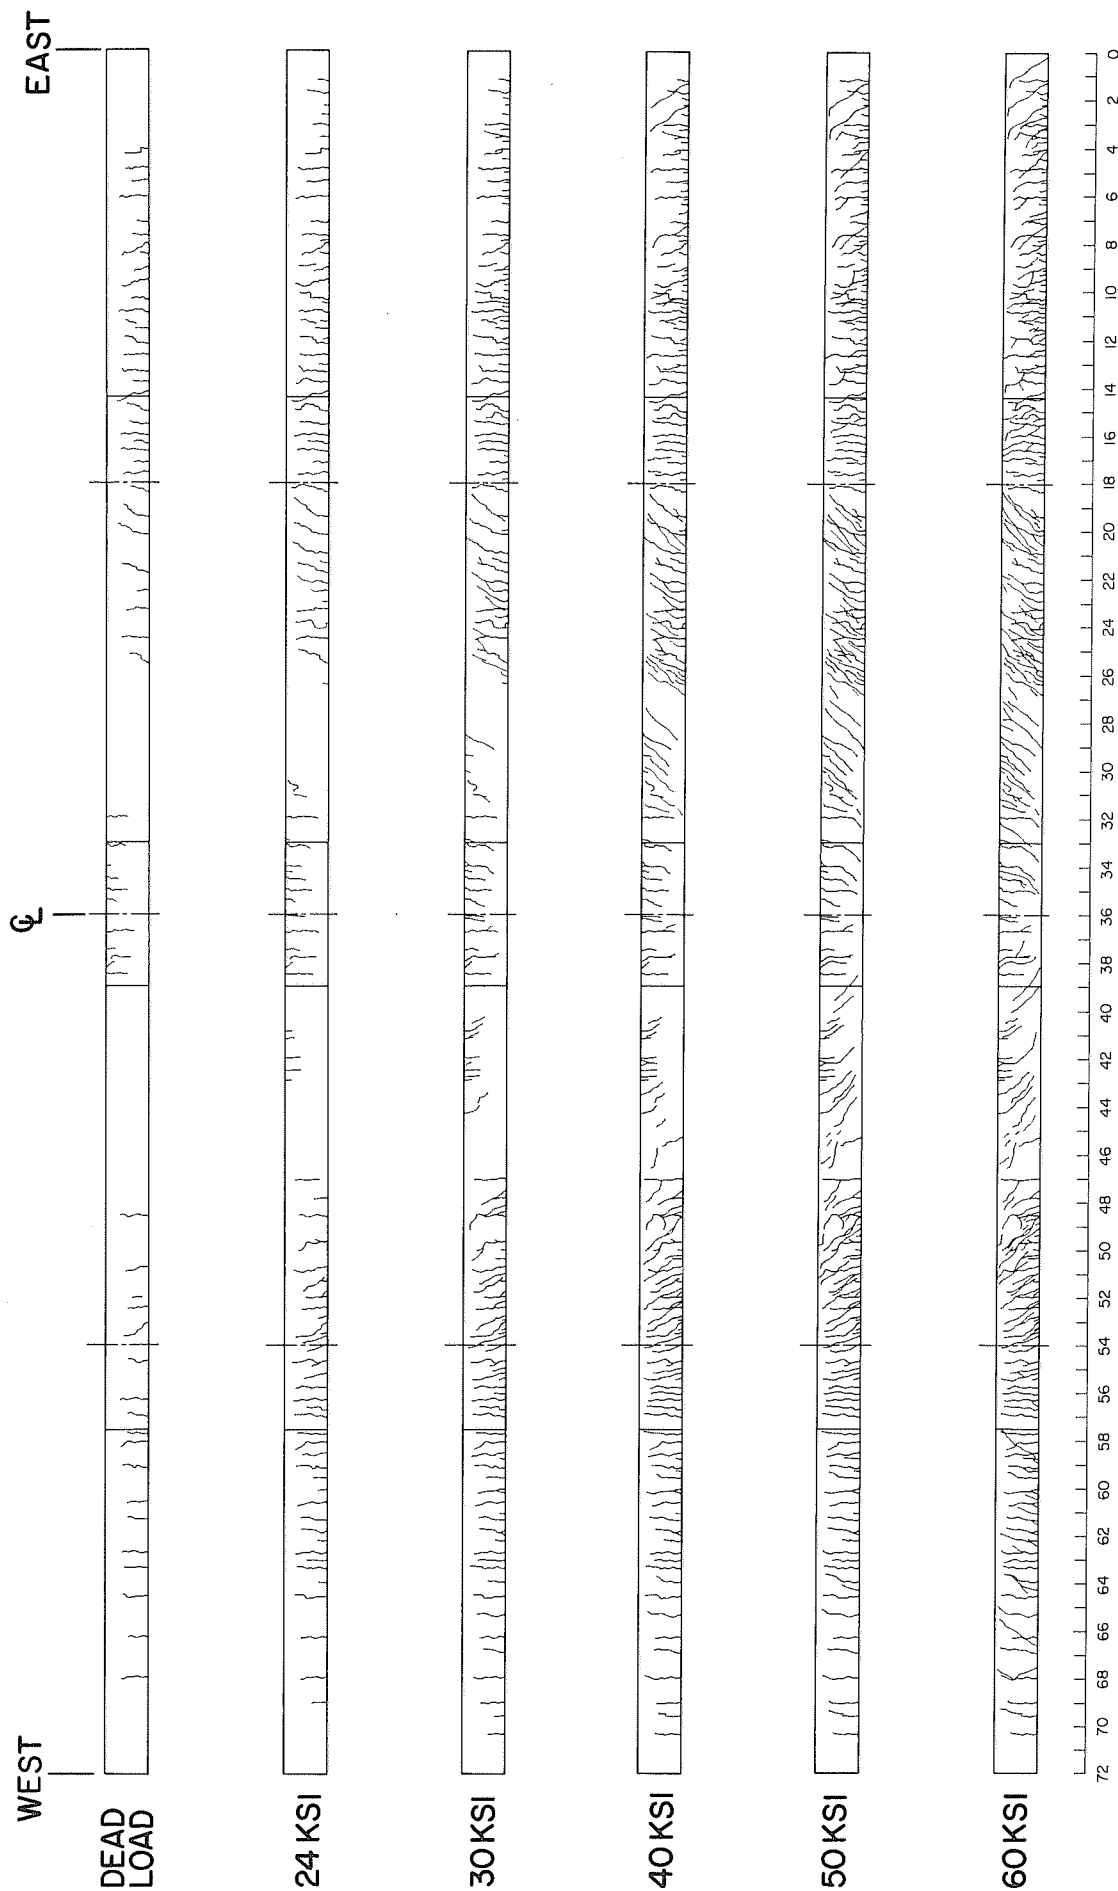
CRACK HISTORY FOR GIRDER 5 (SOUTH FACE)
